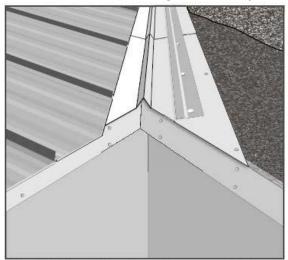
Endwall flashing is applied where the upper slope of a roof meets a wall.
